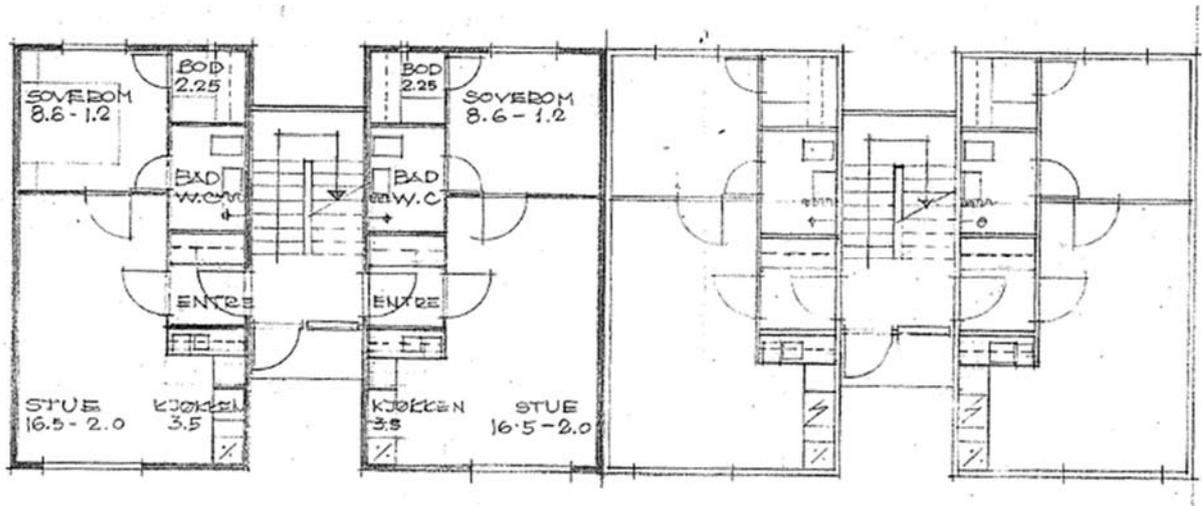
Existing building. Living room (stue) facing South, Bedroom (soverom) facing North.
